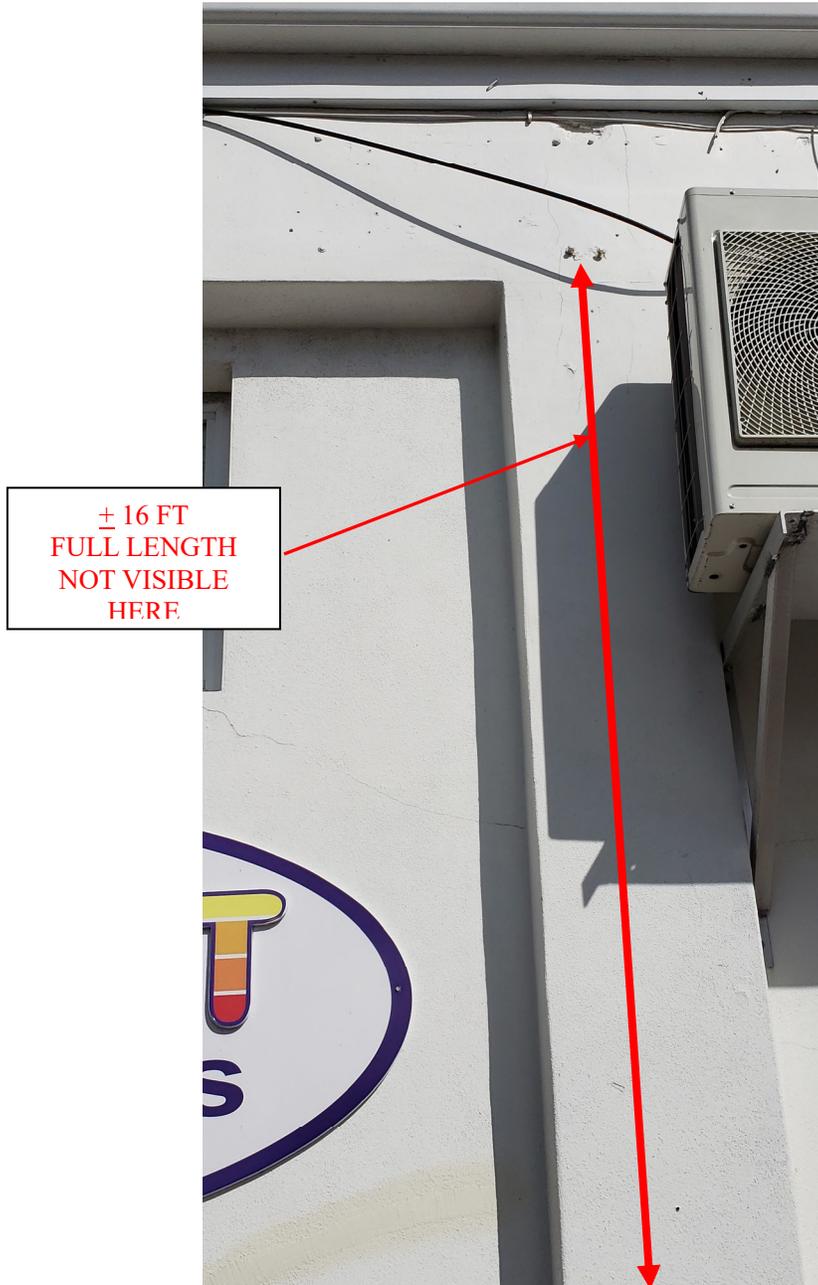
Front Elevation near roundabout. Location 2: Approximately 16 ft long new 16x16 concrete column. See detail 1/S101.
